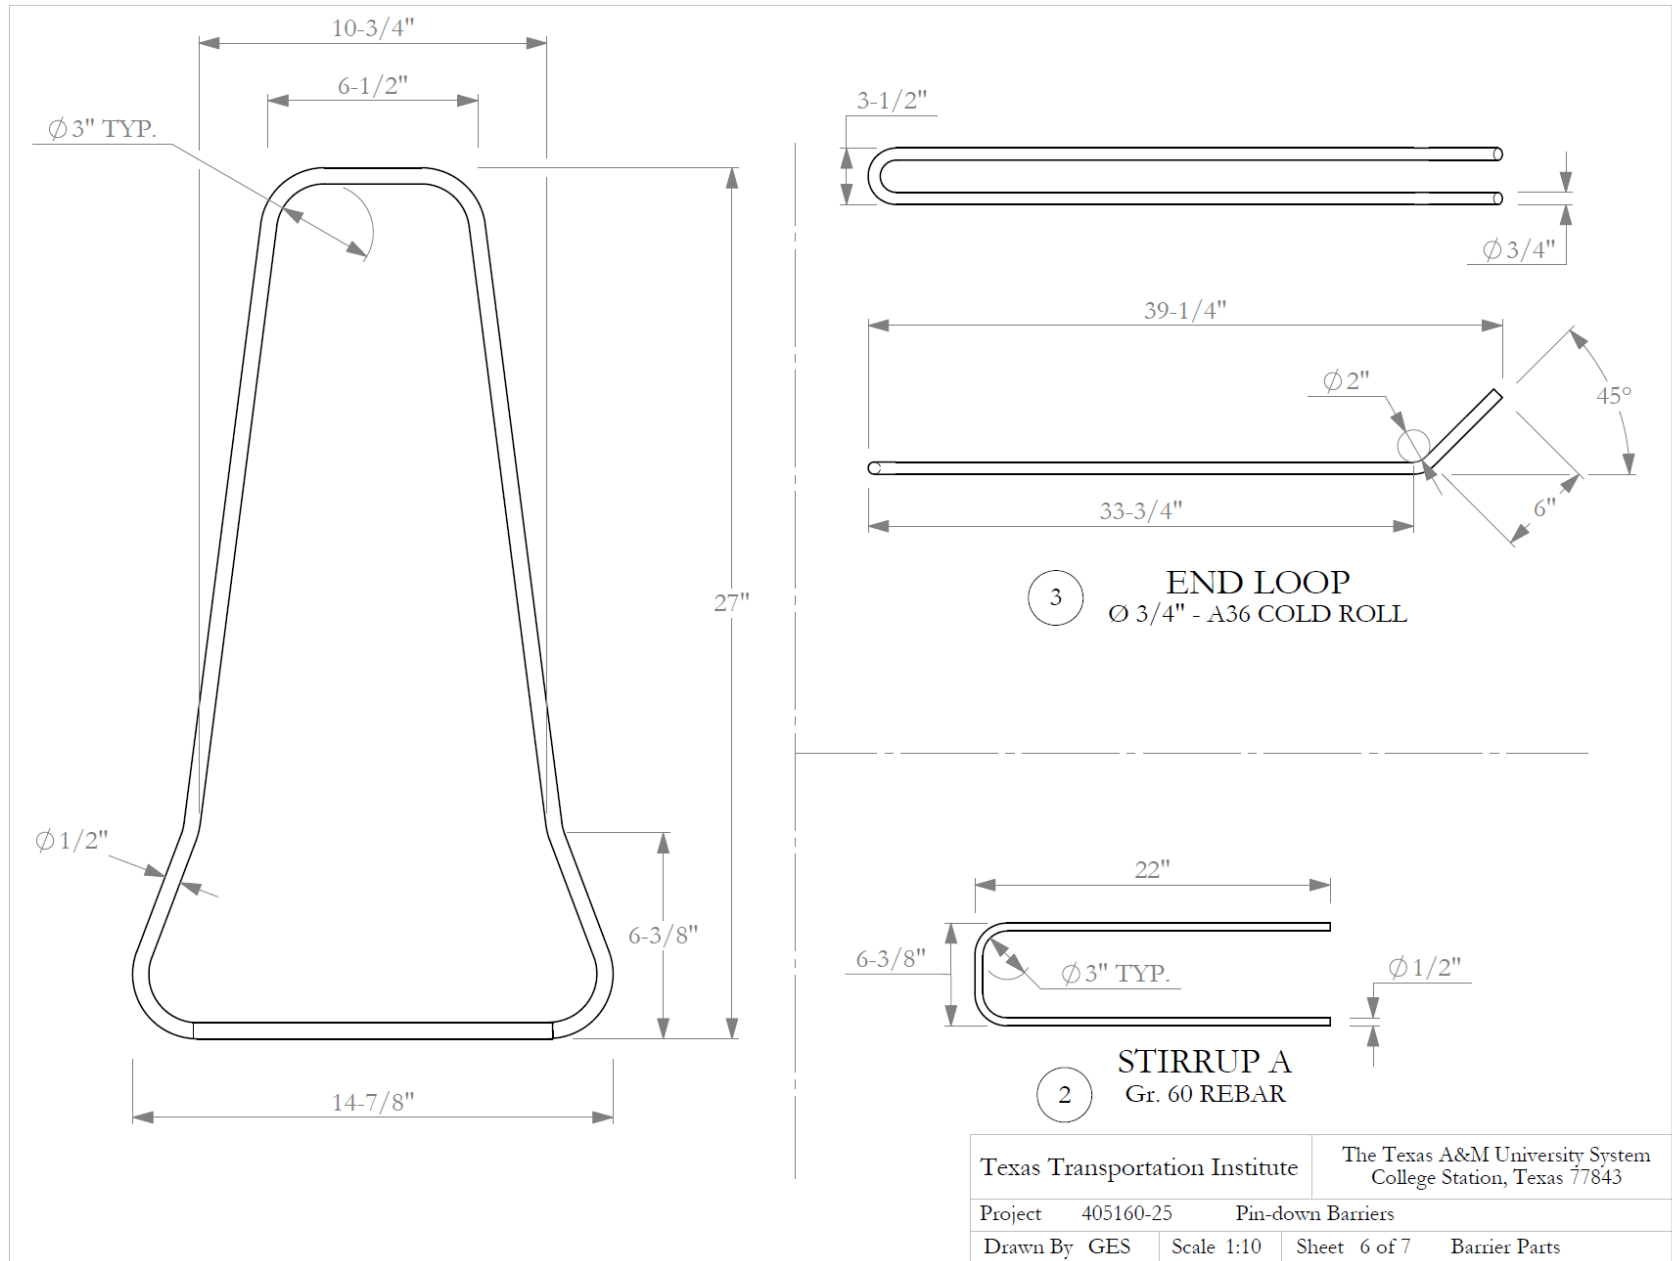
Reinforcement details of the Temporary Concrete Barrier Pinned on Asphalt.
